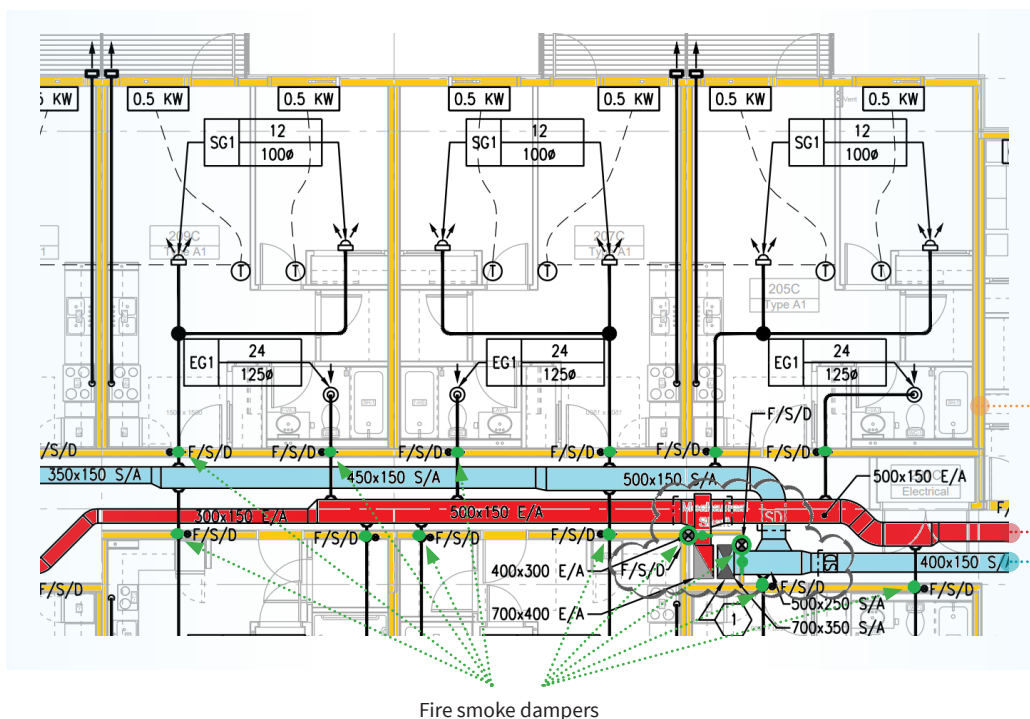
Air distribution schematic in a one-level suite floor plan, highlighting fire smoke damper locations in relation to compartmentation.
